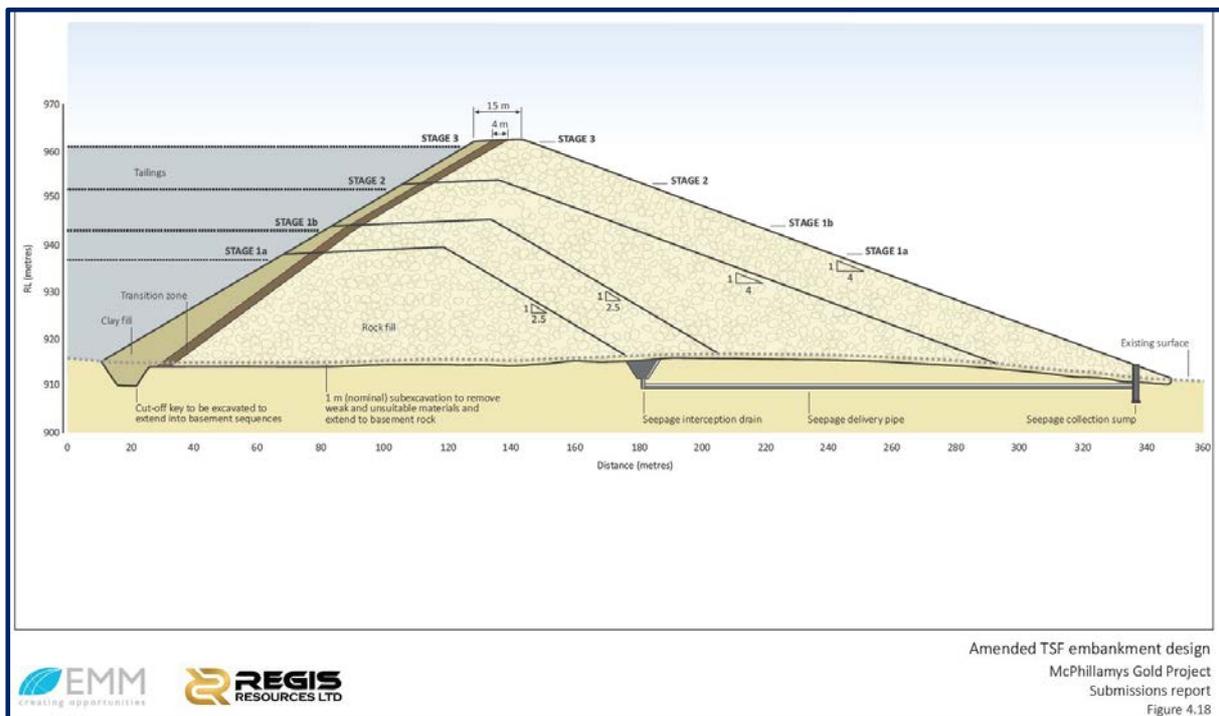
Mine TSF Embankment design and construction (Source: Submissions Report (September 2020))
